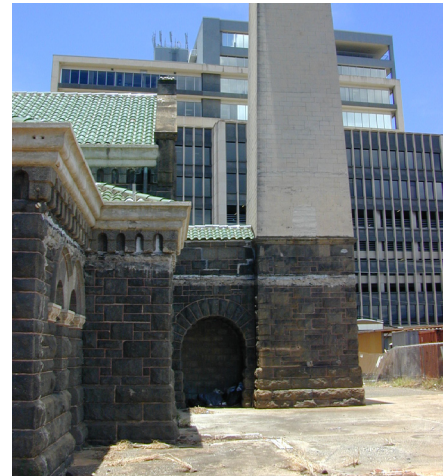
Remaining concrete foundations below the temporary landscaping. Arched opening infill in center removed by HAF.
